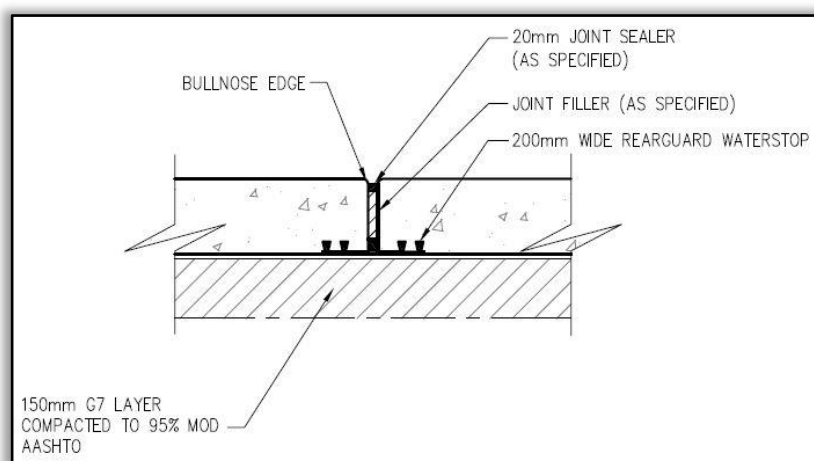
Typical detail of impermeable concrete surface bed at the WHSF
